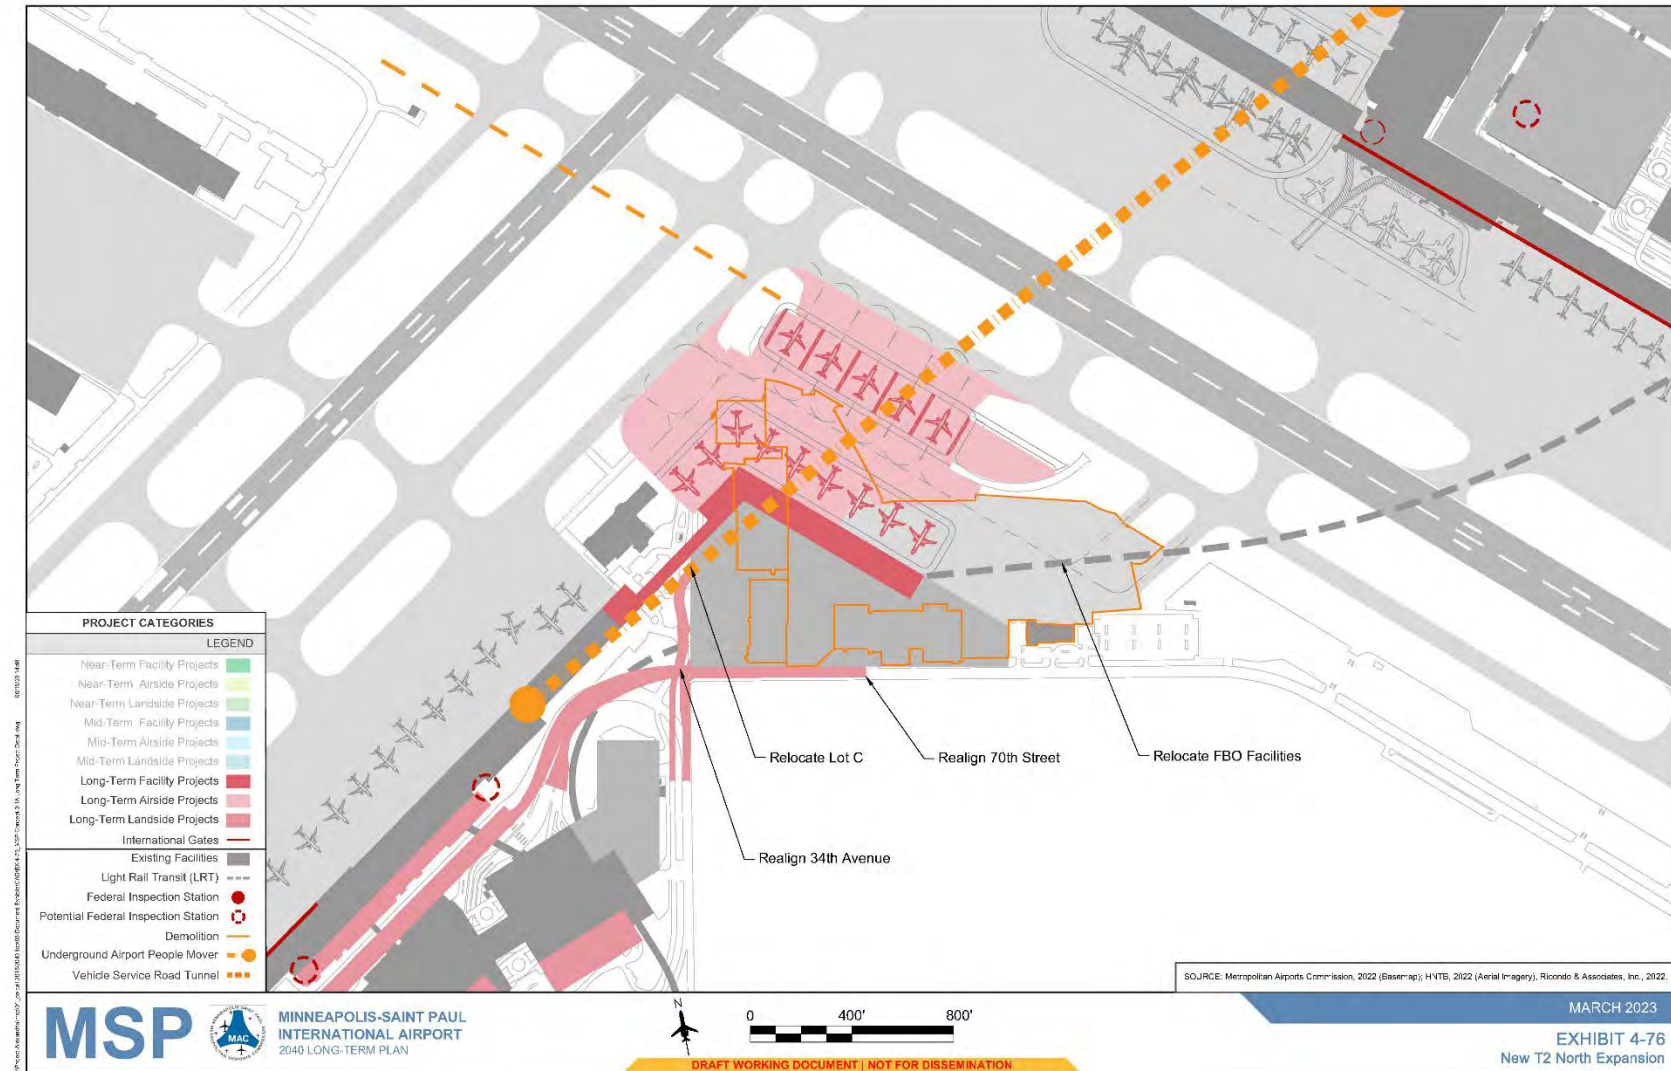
shows the new T2 North expansion project in detail.
